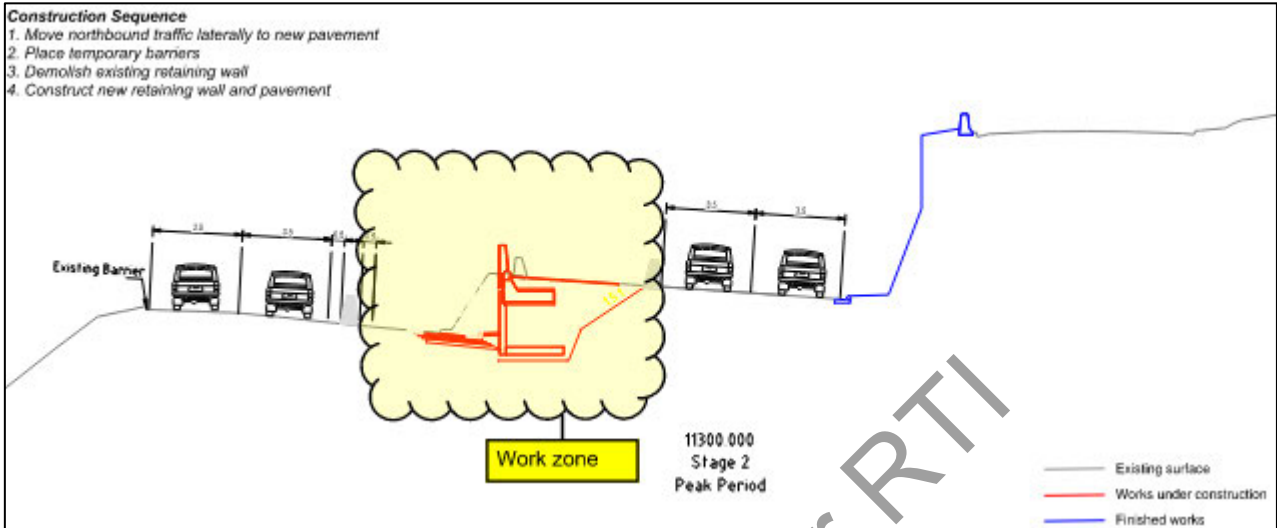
Section 2A Ch 11 300 - Stage 2 Peak Period
